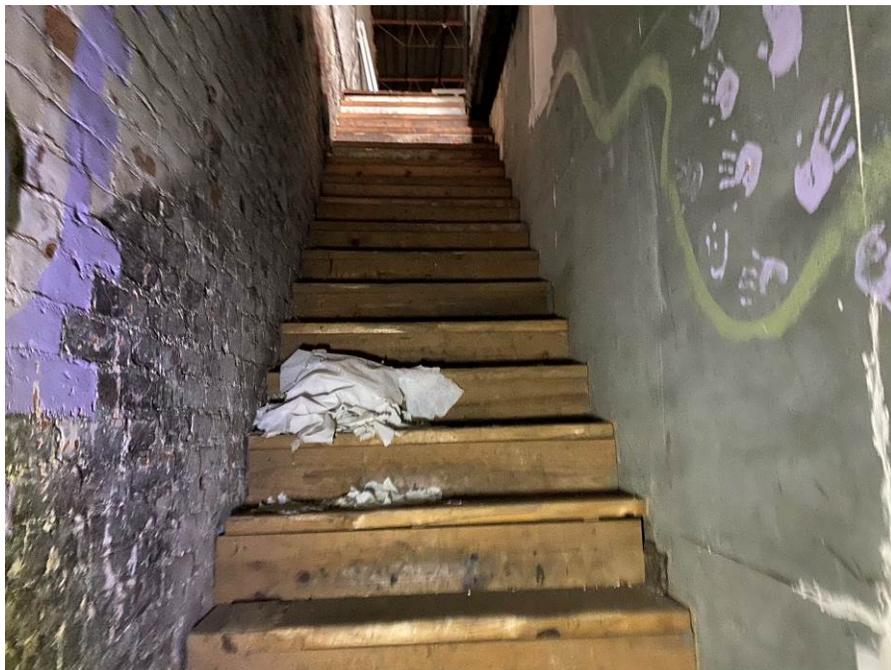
Stair Condition in 88 North Main (Shoring Recommend)
